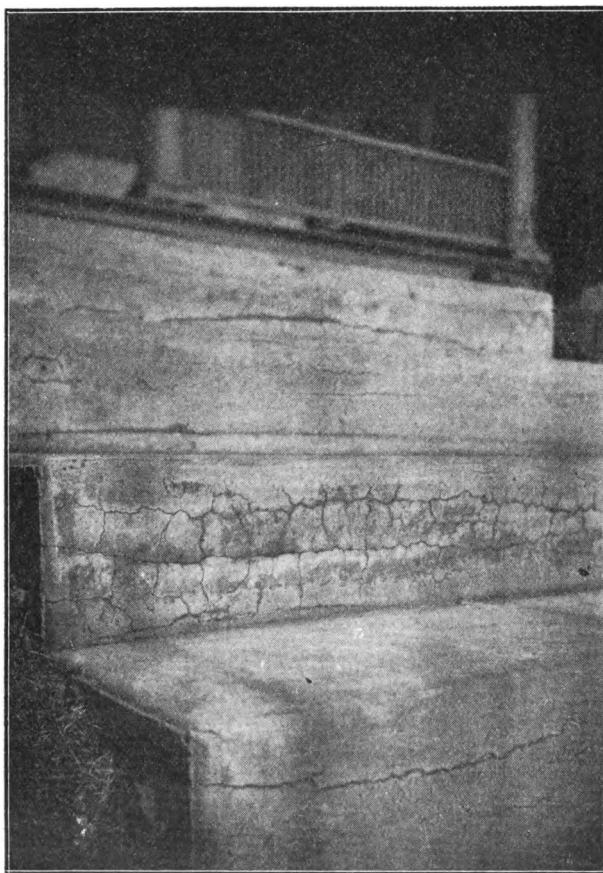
Concrete Steps, Showing Developed Hair Cracks.
